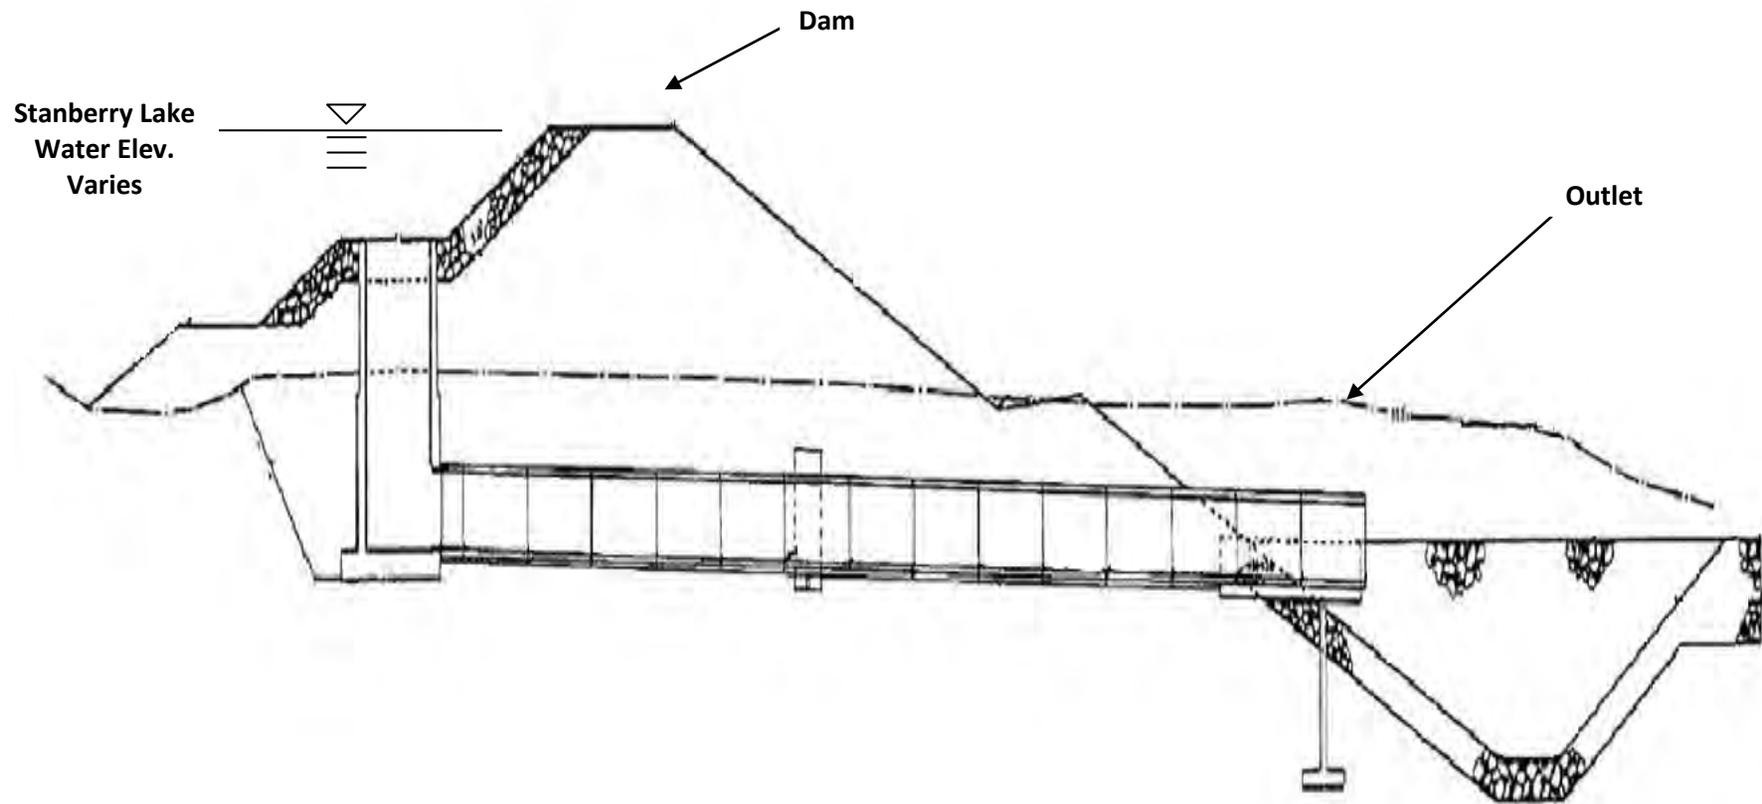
Typical Cross Section Through Drop Inlet Spillway – Stanberry Lake Dam
